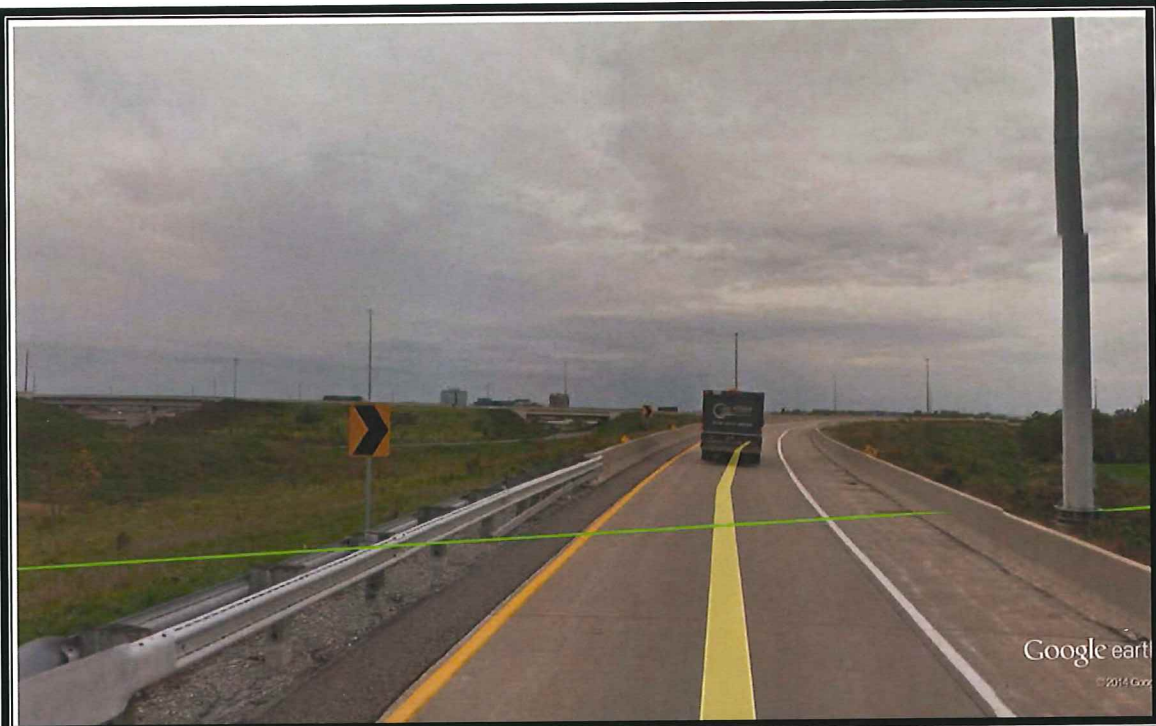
Highway 407 East exit ramp from Highway 404 North, facing north (crossing location shown by green line).
